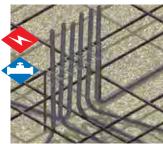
Stiffy Do.uble Loop Slab-on-Grade Trapeze
